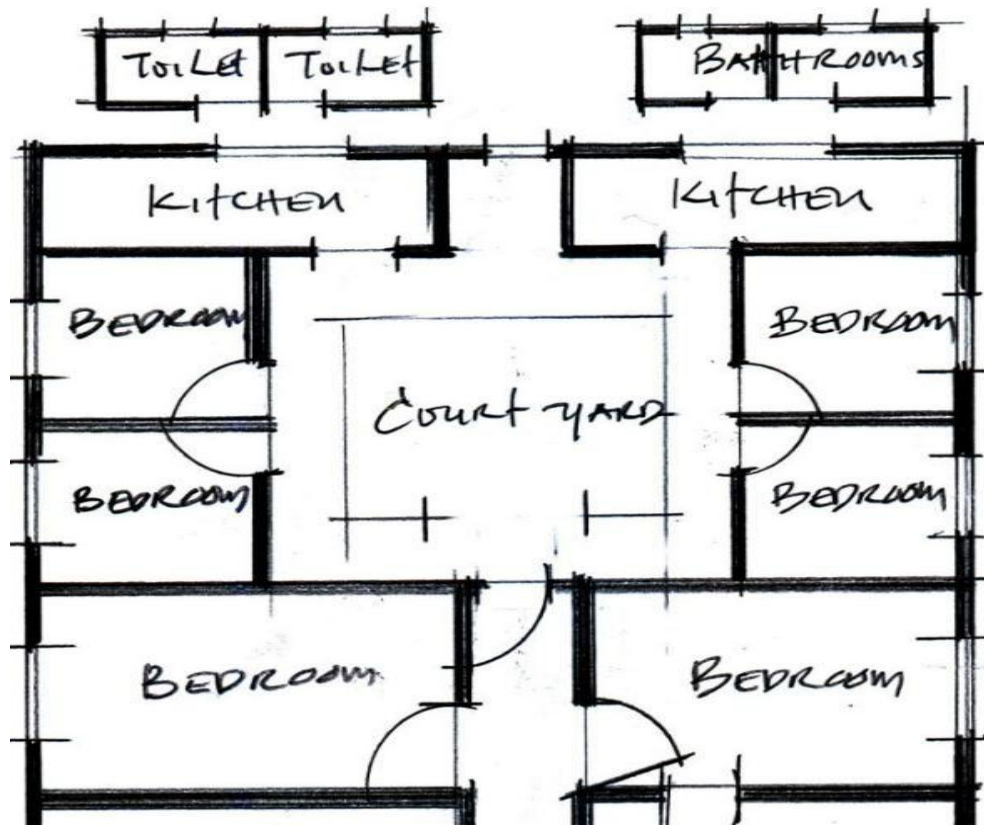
Floor plan of a typical corridor house-type ("face me i face you")
